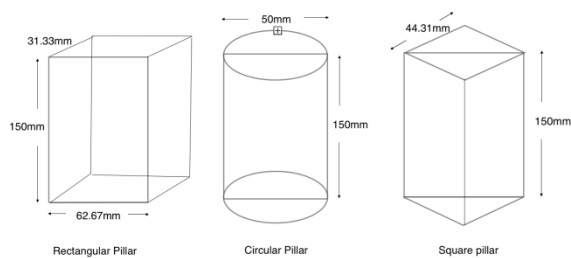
Shapes and dimensions of the test specimens designed for the study.
